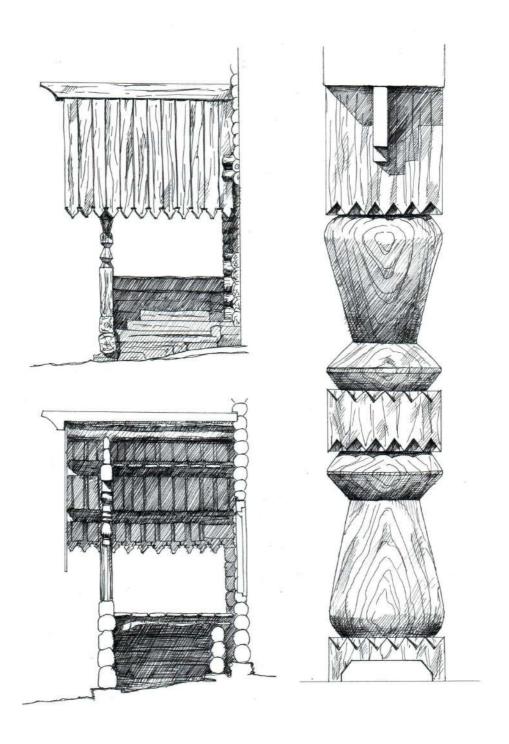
Chapel in the village Keftenitsa. Porch details. Reconstruction
